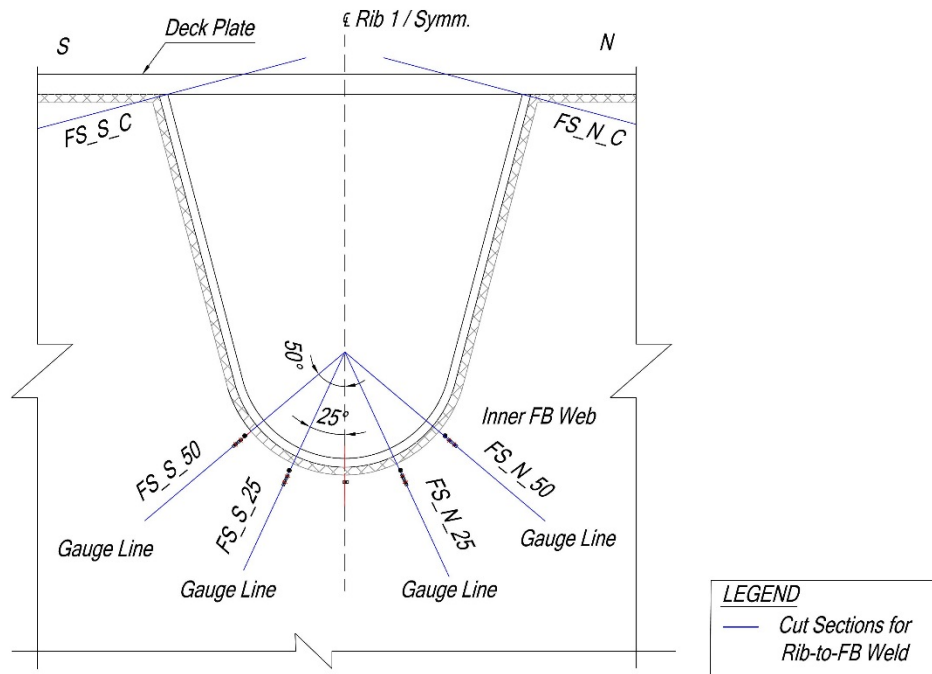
Section identification of Rib 1-to-inner floor beam weld
